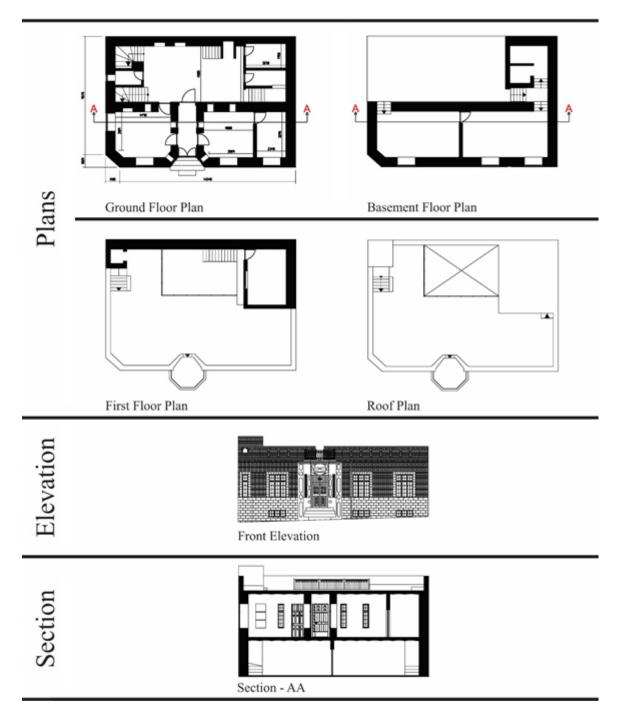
Plans, elevation and section of house 02. (Abbas, 2015)
